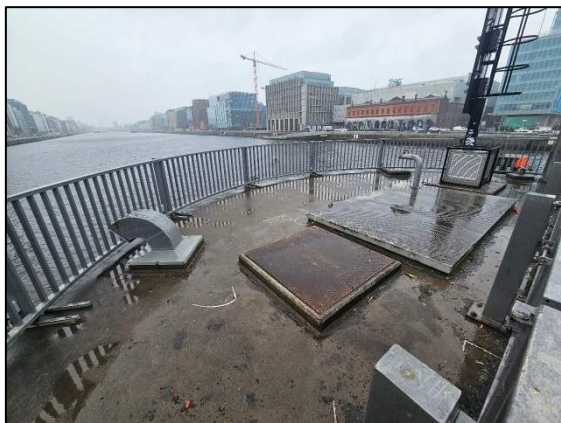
Utilities on existing bridge abutment [JM: 30 October 2025].
